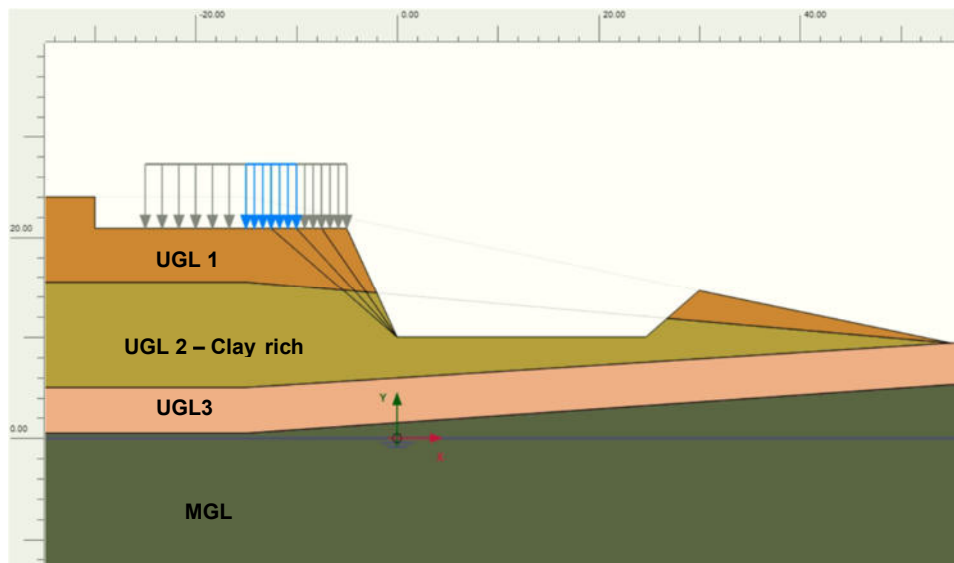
Preliminary model used to assess slope stability at the back of the excavation indicated in yellow in Figure 1-1 above
